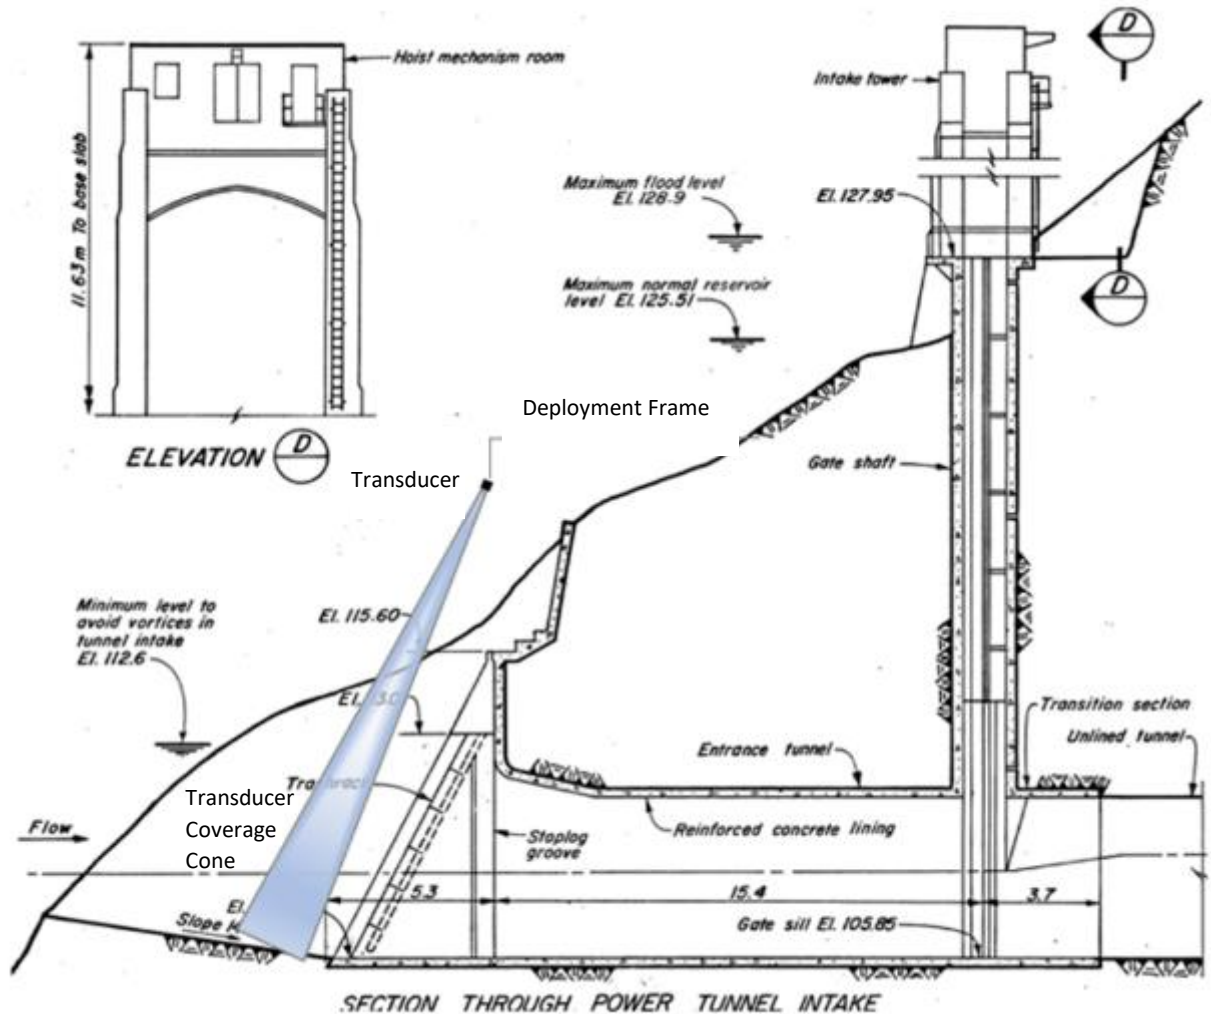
Section through Headworks Tower intake showing details of the trash rack; all elevations in masl (Source: BC Hydro with additions by LGL Limited).
